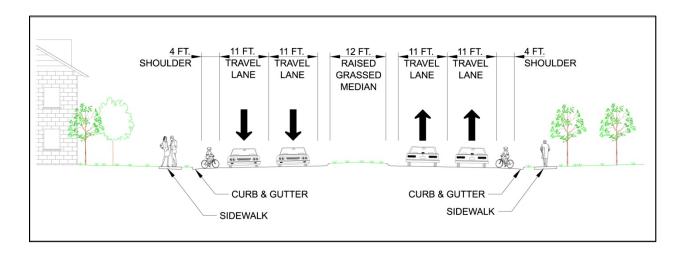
PREFERRED ALTERNATIVE (ALTERNATIVE B MODIFIED) ROADWAY SECTIONS
